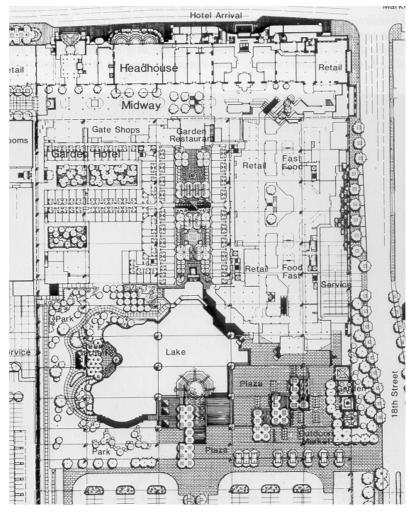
St.Louis Union Station - Ground floor plan after renovation
